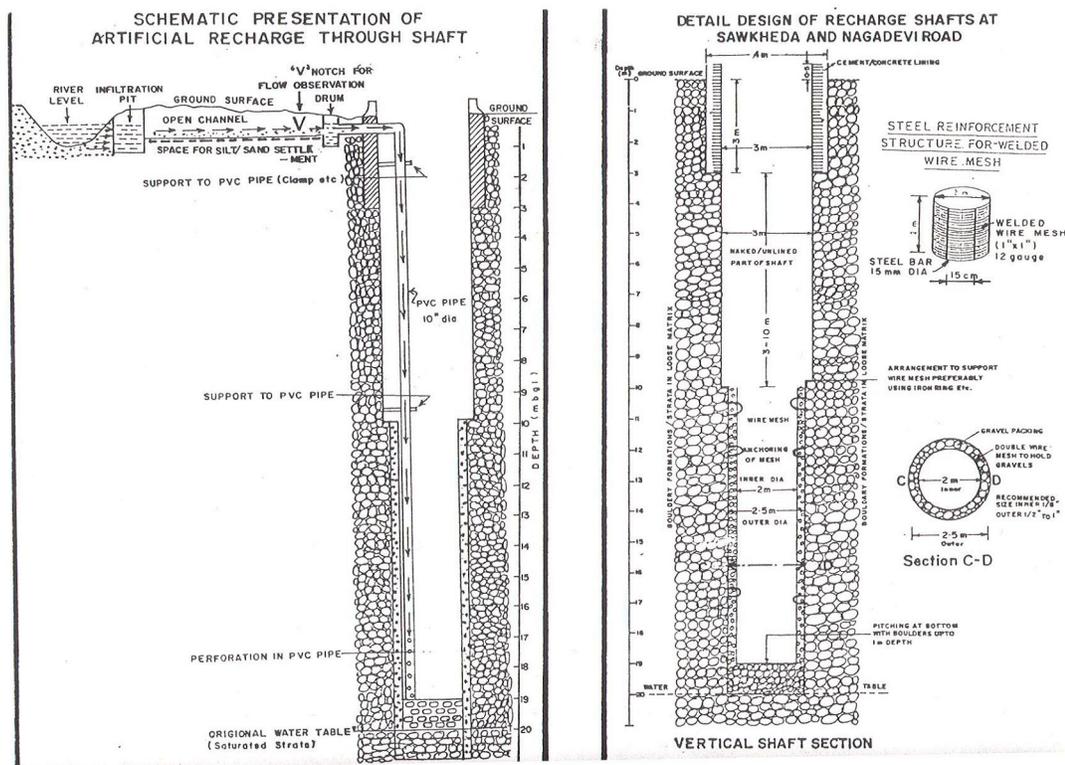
Design Particulars of a Typical Recharge Shaft
